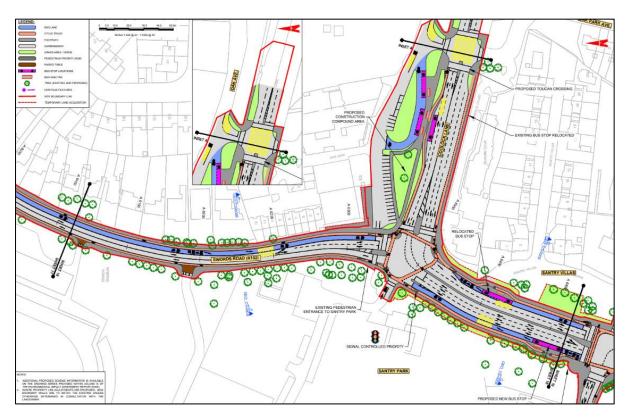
Extract from General Arrangement Drawing (Sheet 18)
